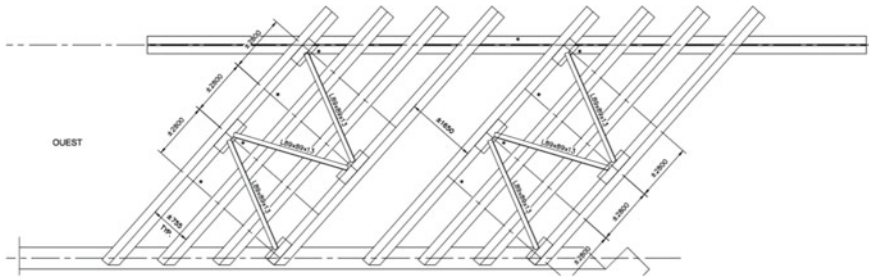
Plan view of span 1 (Span 5 has a similar configuration)
